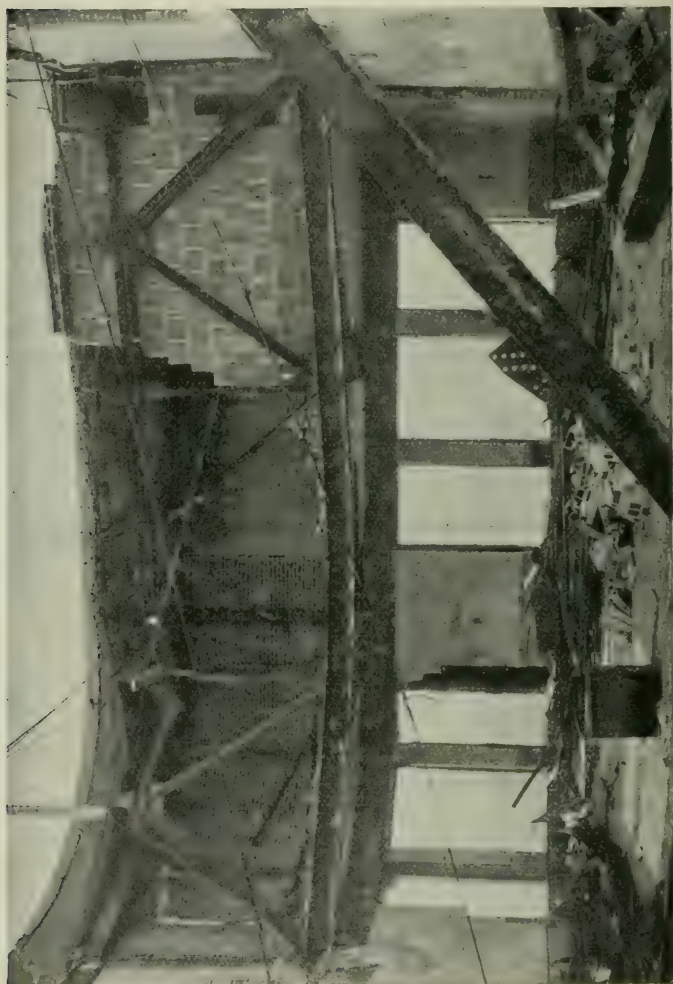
Mutual Life Building, San Francisco, Cal. Roof Trusses damaged by Heat through failure of Clay Fire Protection.
